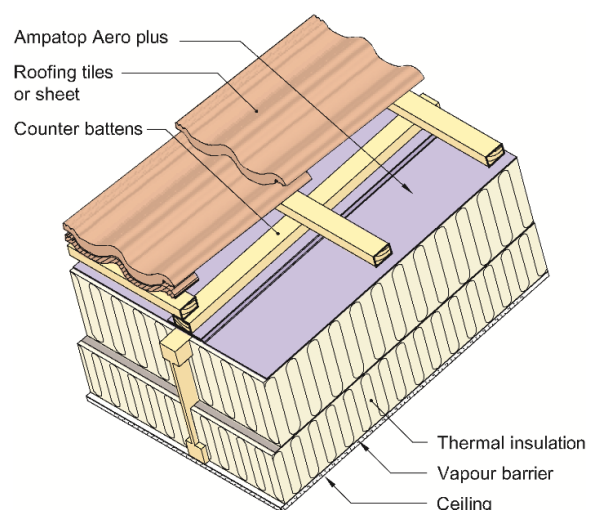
Principle of the situation, Ampatop Aero plus in a roof construction.
